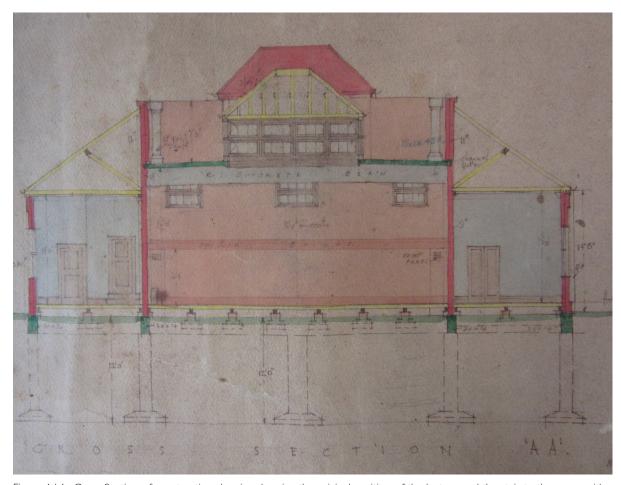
Cross Section of construction drawing showing the original position of the lantern and the stair to the rear - with the dark coloured roof. The pitched roof to the lantern was not built. A lower cost flat roof was built. The piles and piers are shown. Source: Waverley Council
